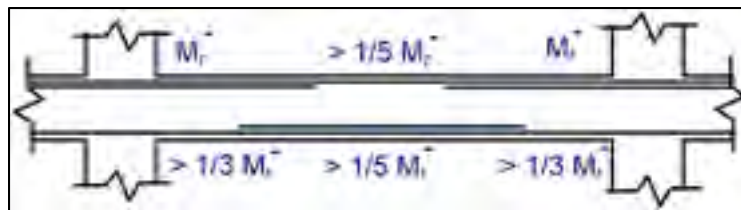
Arrangement of longitudinal reinforcement in beams in moderately ductile frames
